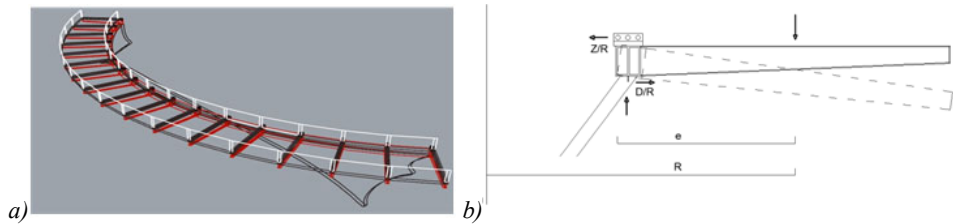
a) Structural scheme of the deck and b) its cross-section.
